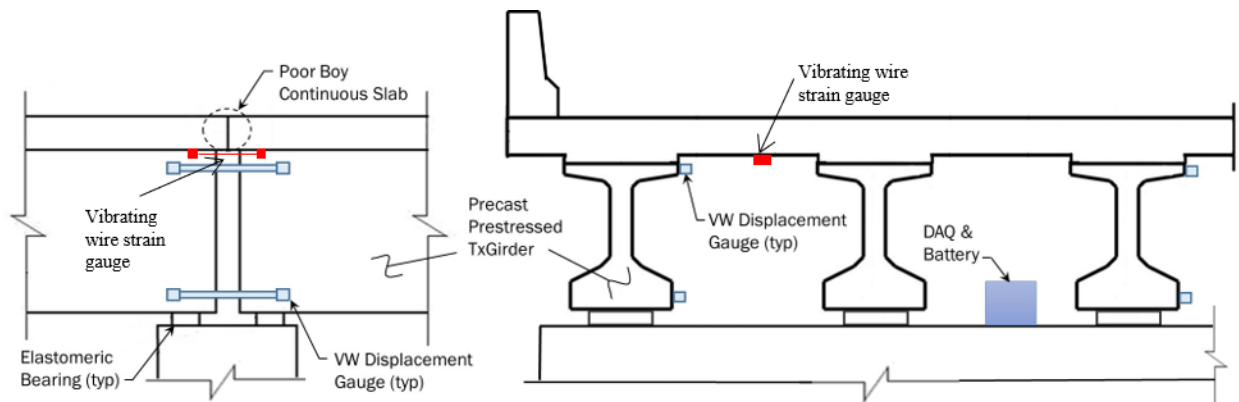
General layout of instrumentation at girder ends (Birley et al., 2025)
